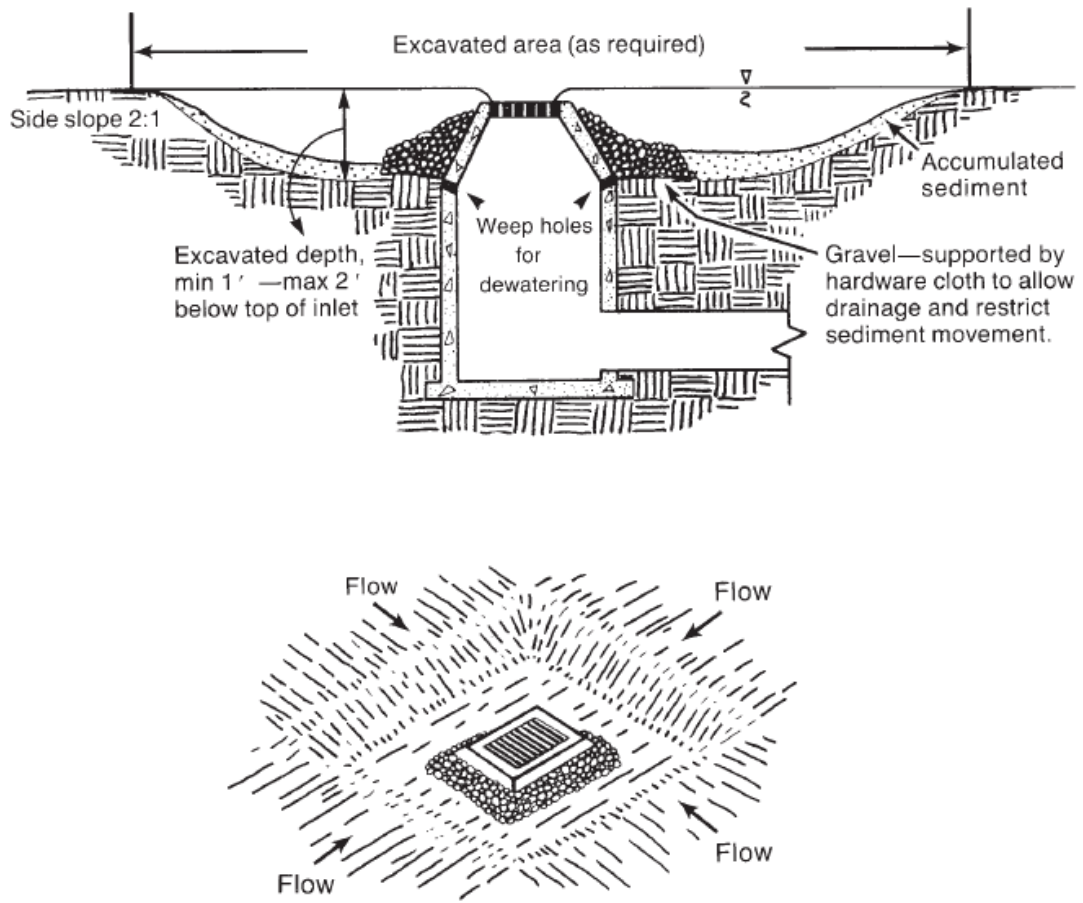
Excavated Inlet Protection (Source: NCDENR)
